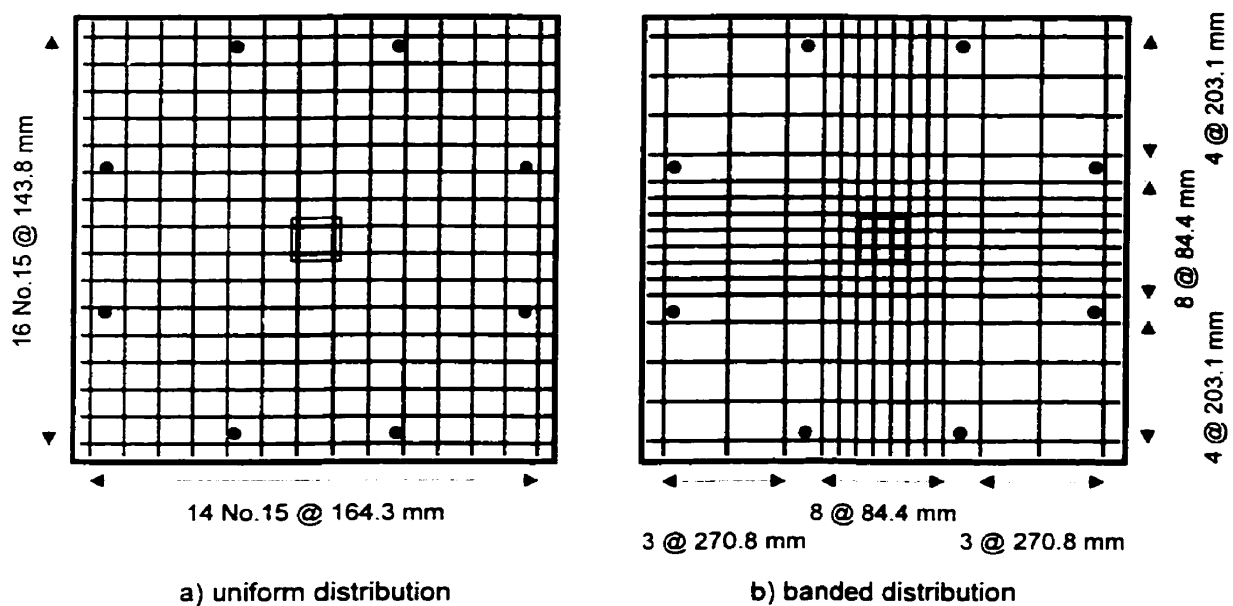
Slab-column test specimen (2.3 m x 2.3 m)
